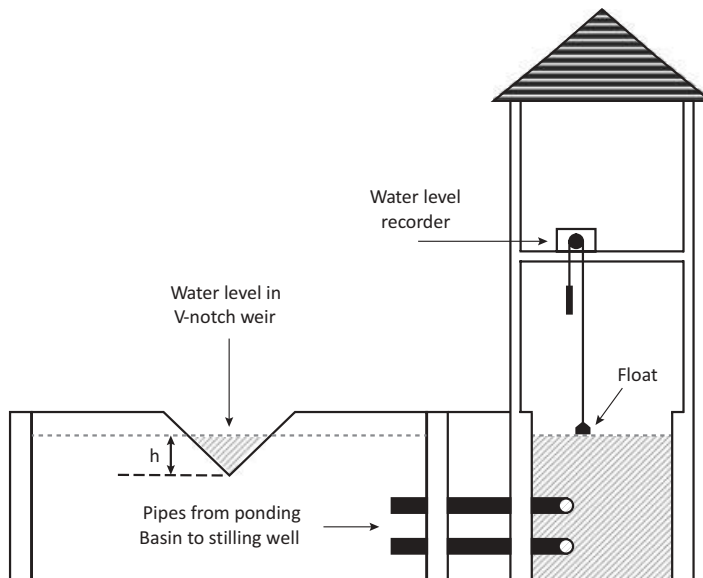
A schematic illustration of a weir with a V-shaped notch on the weir blade
